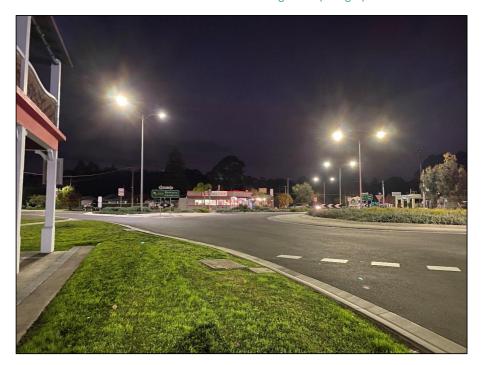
Gauge Track at Tamboon Road intersection – facing east
